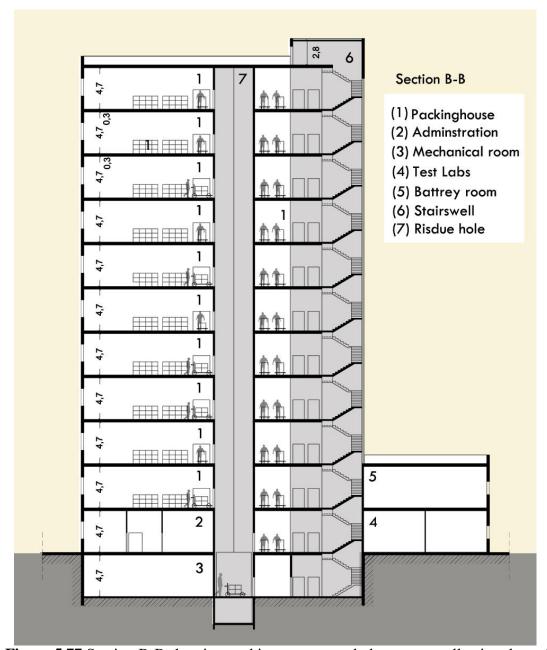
Section B-B showing packing process and plant waste collection through vertical hole
